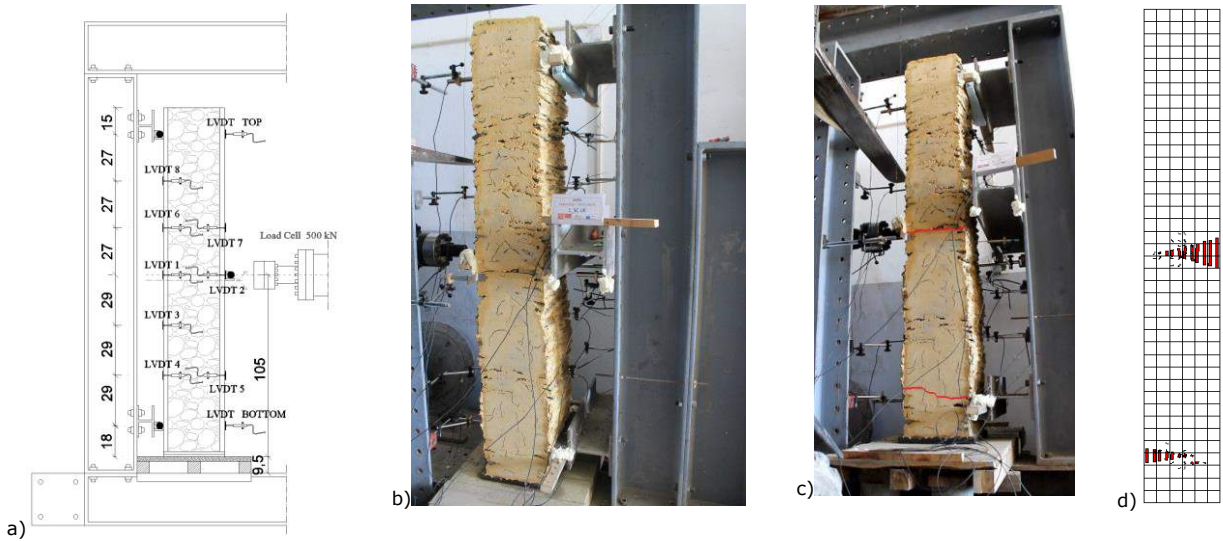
Experimental evaluation of the reinforcement system in columns. a) test setup (scheme); b) test setup; c) real crack pattern; d) crack pattern (FEM)
